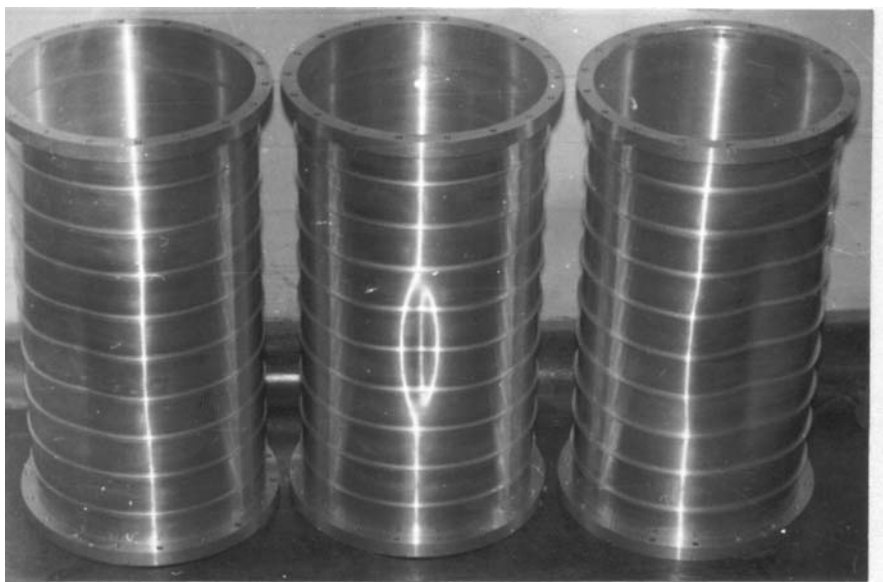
Collapsed Models 4,5 & 6 (general instability).
